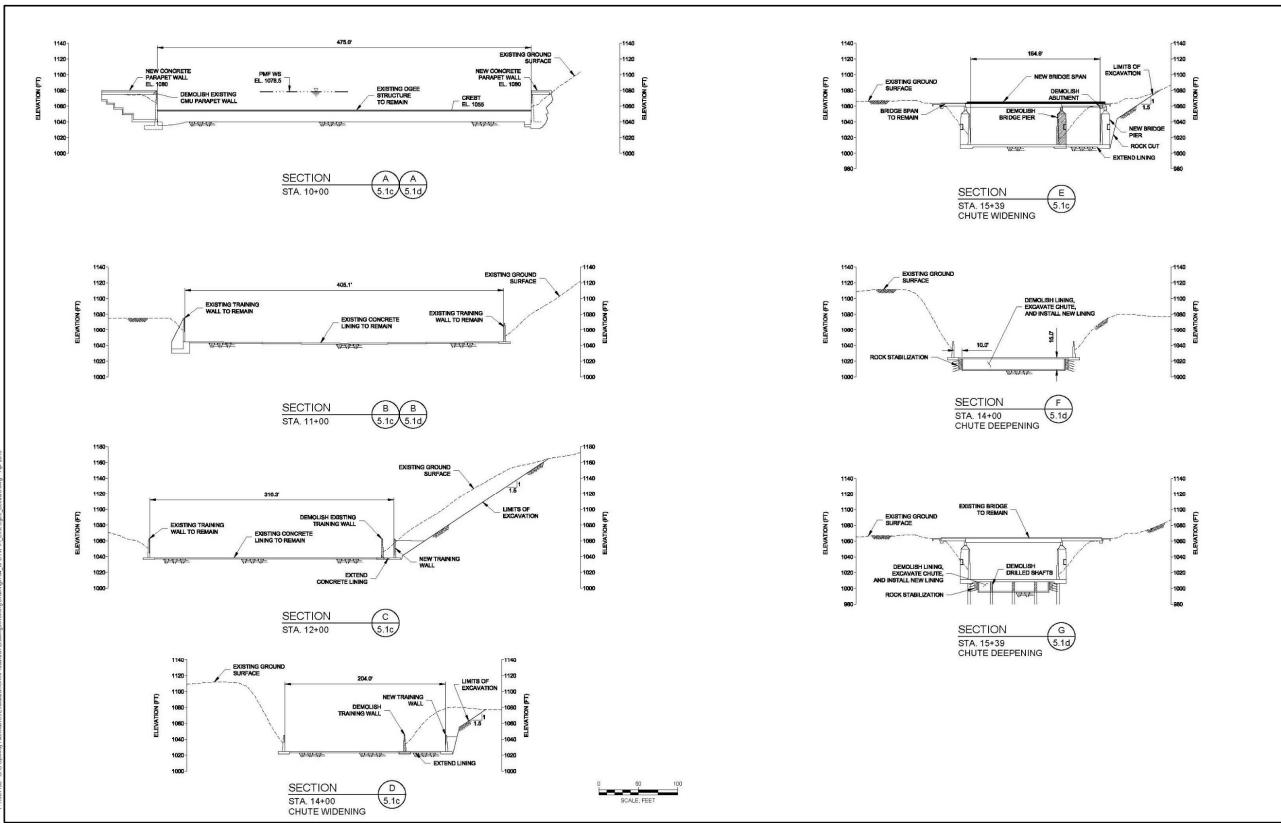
Section Views of Spillway Channel Widening and Deepening Options
